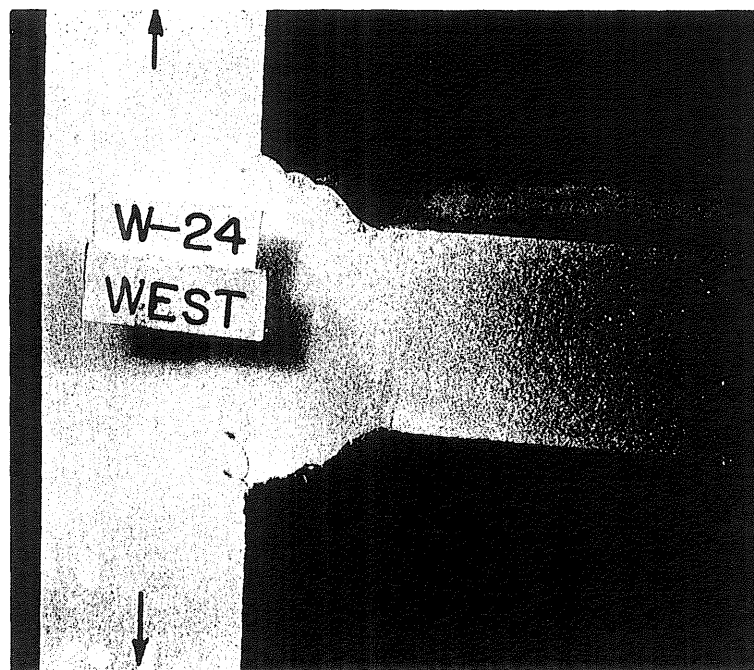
TYPICAL FRACTURE FOR AS-ROLLED PLAIN PLATE WITH FULL PENETRATION ATTACHMENTS ON TWO SIDES.
